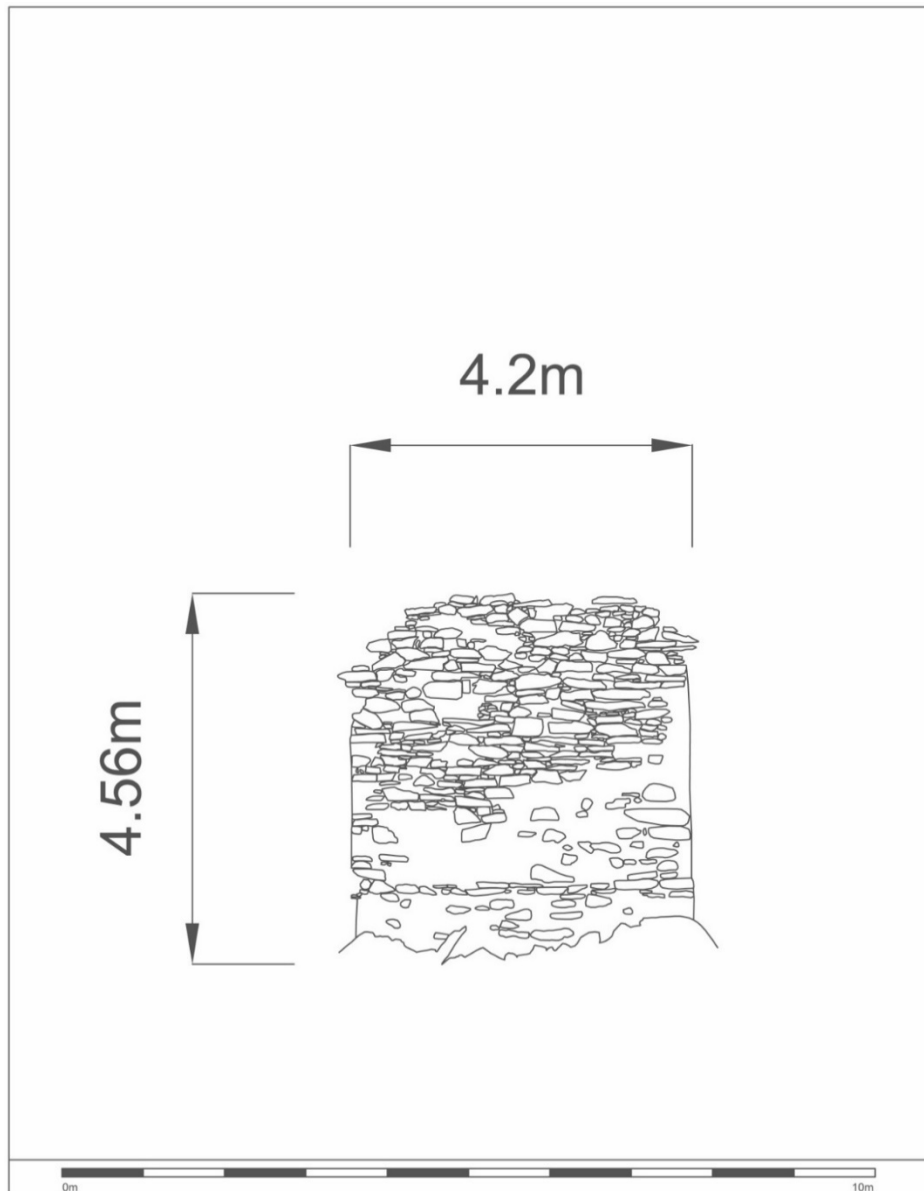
Internal elevation of the west wall of Saddle Hill Signal Tower.
